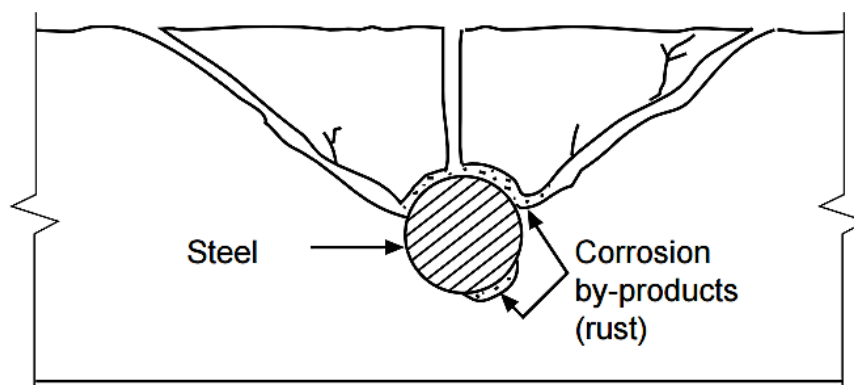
The expansion of corroding steel, causing formation of cracks, delamination, and spalling.
